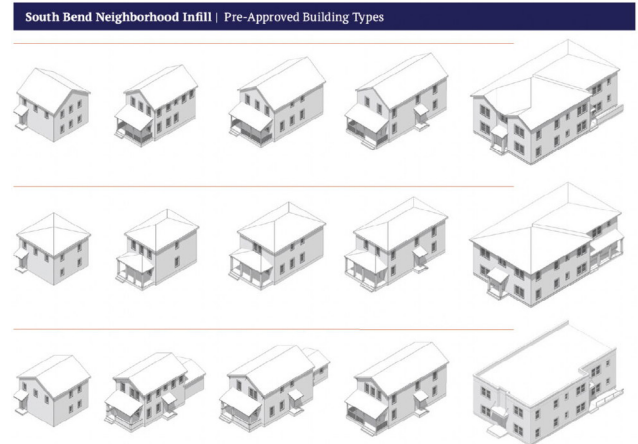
Pre-approved building plan designed to align with neighborhood character in South Bend, IN.
